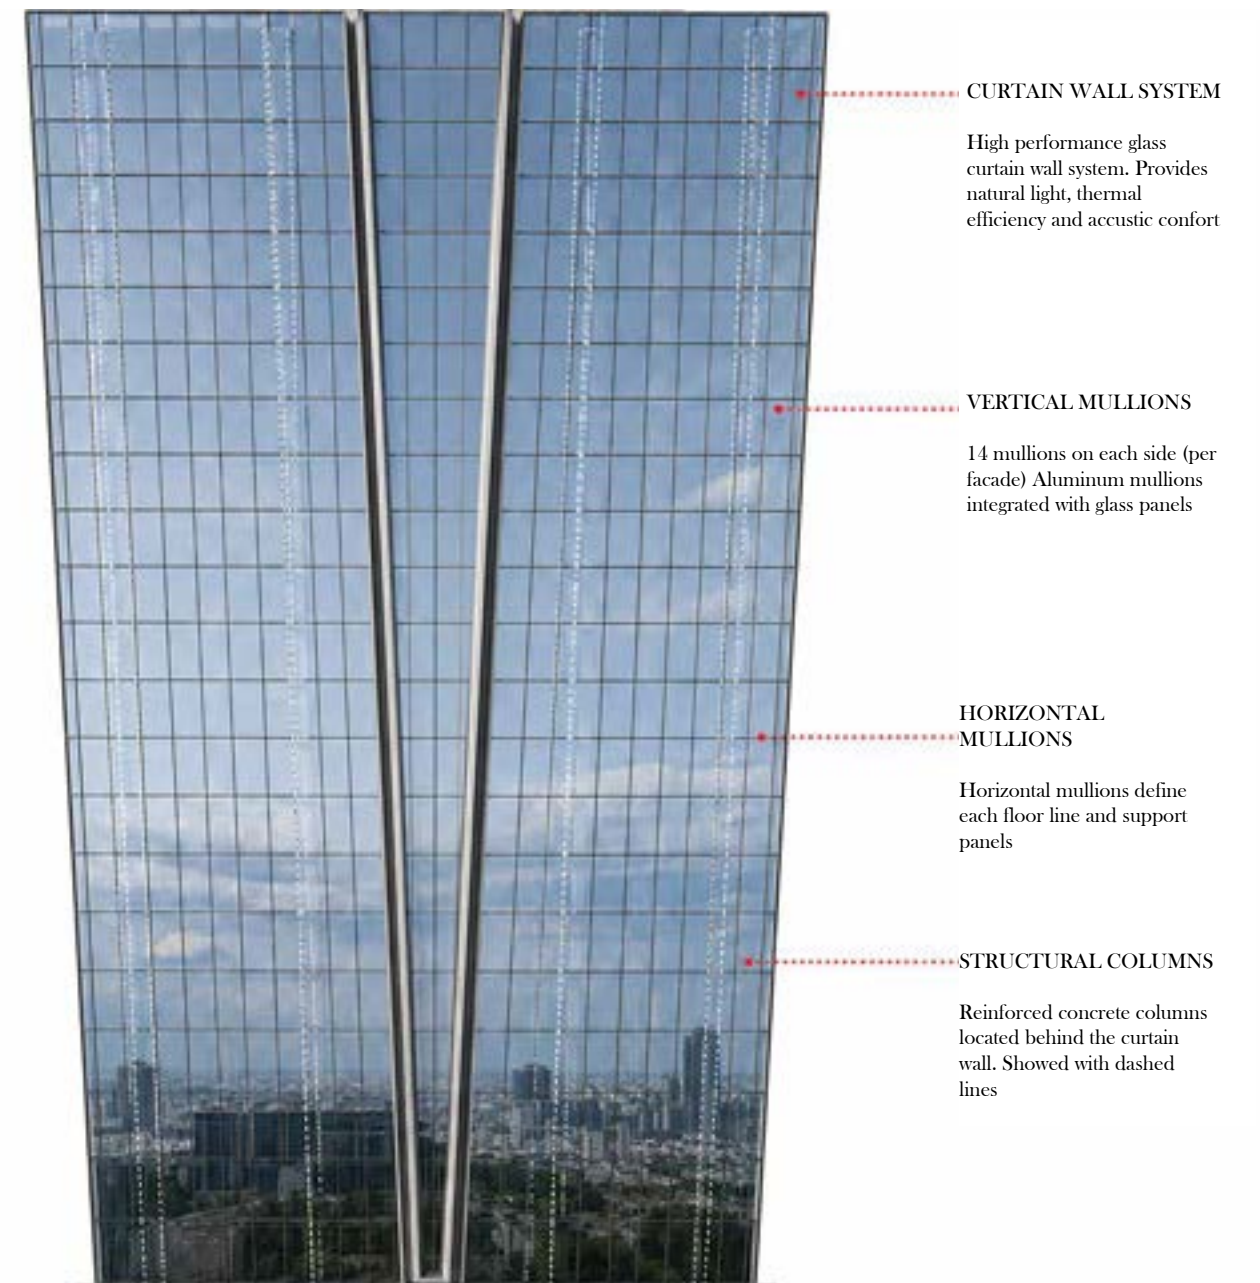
Existing Torre Banco de la Nación Curtain wall system.
